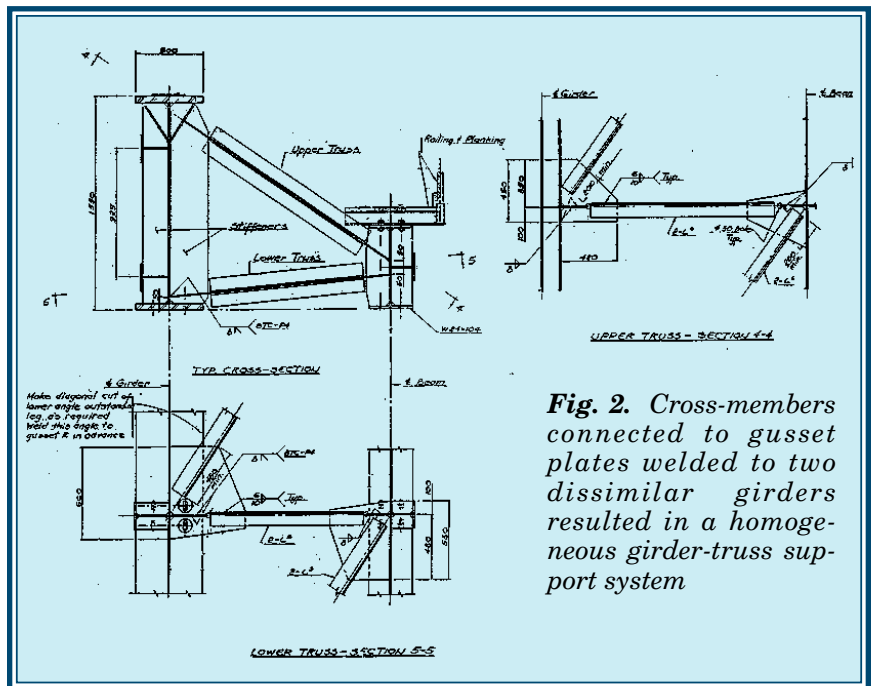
Cross-members connected to gusset plates welded to two dissimilar girders resulted in a homogeneous girder-truss support system
